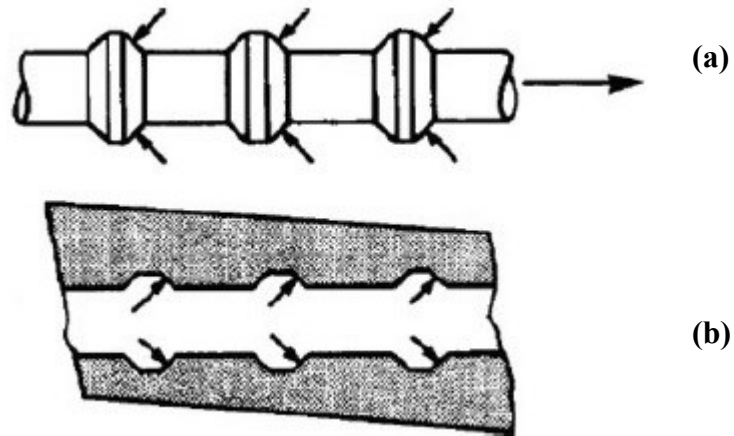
Schematic of forces on (a) deformed rebar; and (b) concrete during pull-out testing (Esfandeh *et al.*, 2008)
